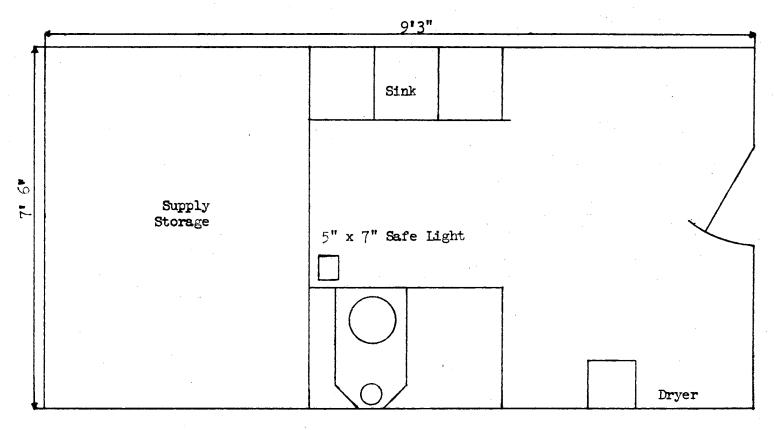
DARKROOM FLOOR PLAN - DUNCAN DAILY BANNER. (SCALE 1/2" = 1')
